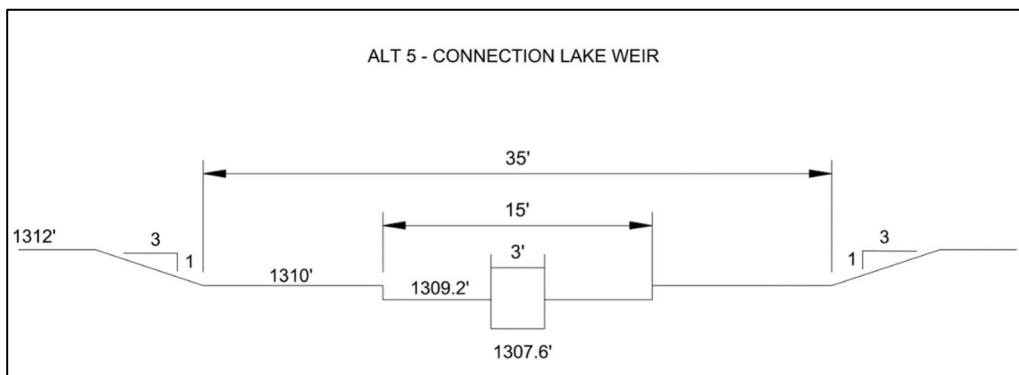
Alternative 5 Connection Lake Outlet Structure Layout
